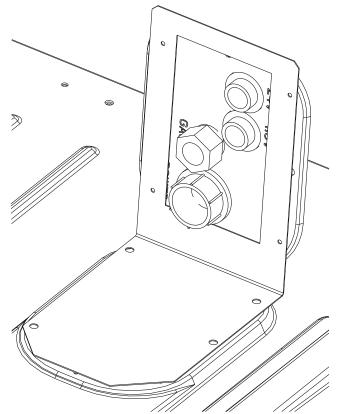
Thru-the-Base Fitting Assembly (Shown in Shipping Position)
